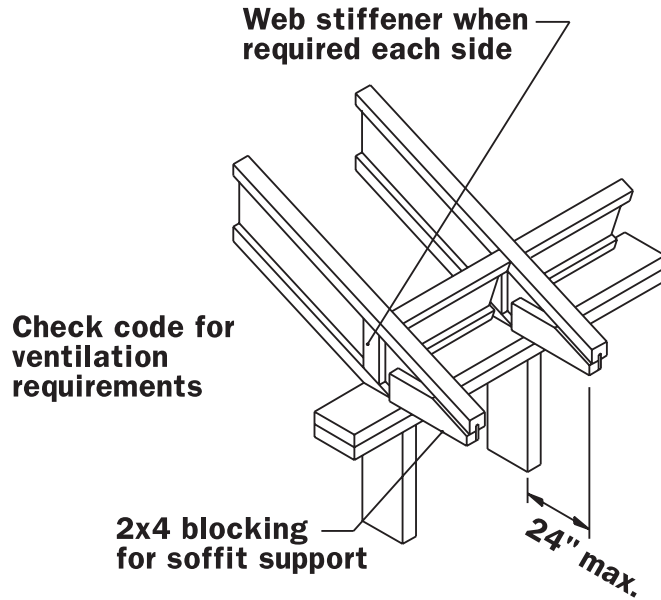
I-Joist Roof Rafter Bearing on Exterior Wall With Lumber Overhang
